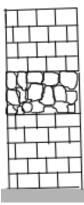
Masonry wall with horizontal stone ties (by author)
